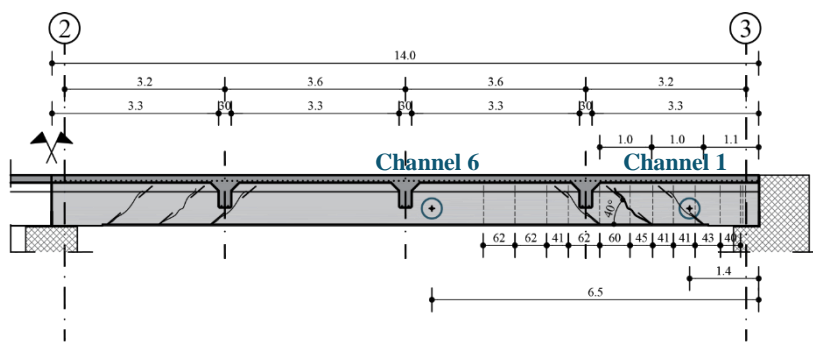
Tested bridge span with indicated cross beams distributed over the length of girder system, positions of AE sensors (circles with dots), monitored shear crack (at a distance 2.1 m from the right end of girder) and indicated distribution of stirrups.
